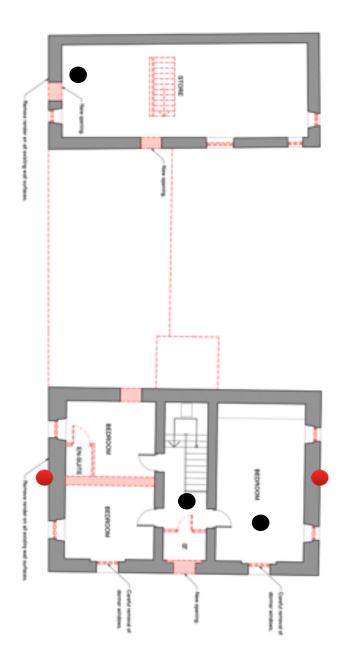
Bat dropping sightings (in black) in the upstairs store area and the attic of the main house and recorded sites of soprano pipistrelles exiting building (in red).
